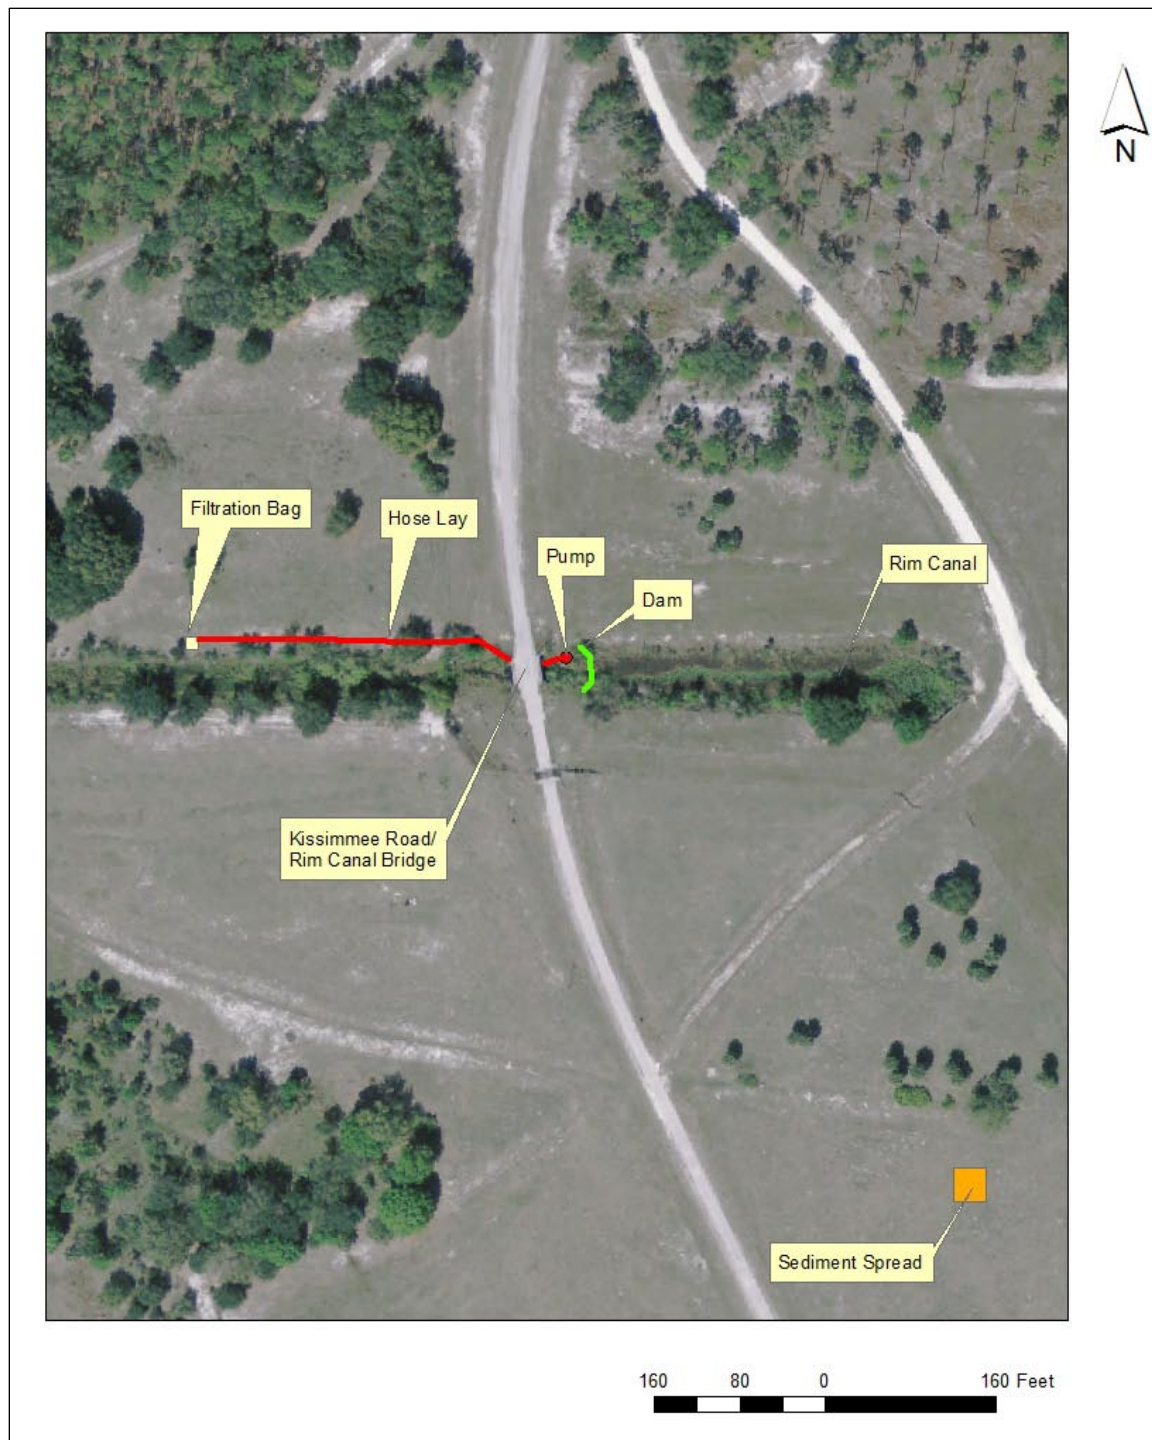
Aerial view showing the dewatering of the Kissimmee Road/Rim Canal Bridge.
